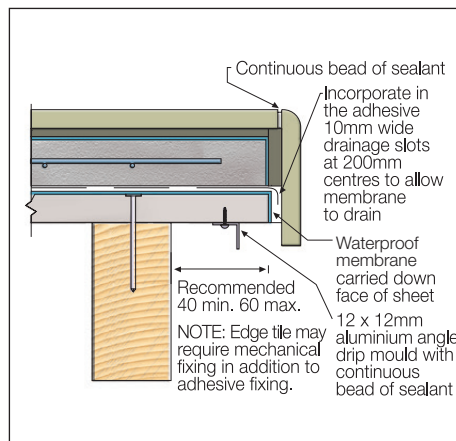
METHOD 2 - DECK EDGE DETAIL USING TILE
